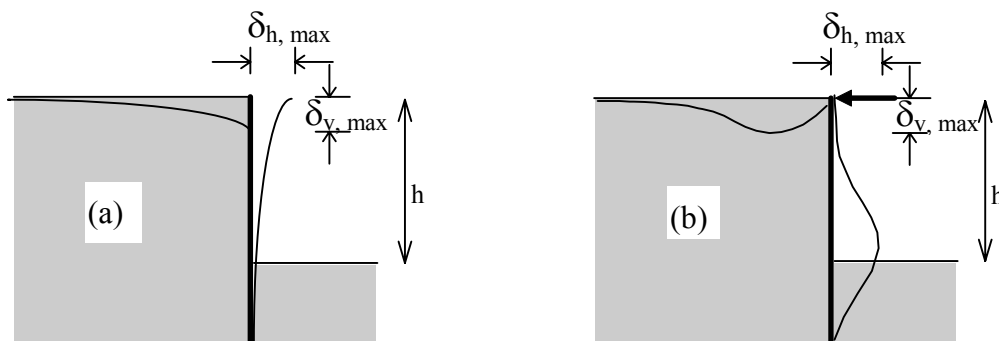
Horizontal deflection and settlement pattern of a retaining wall: a) cantilever wall, and b) propped wall
